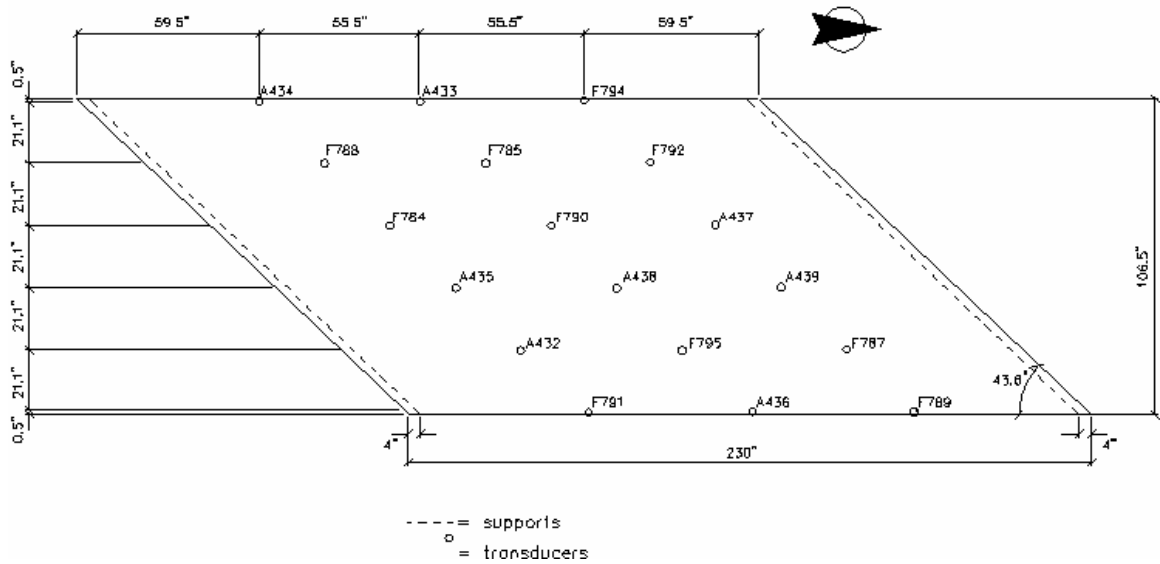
Deflection instrumentation locations on the skewed deck.
